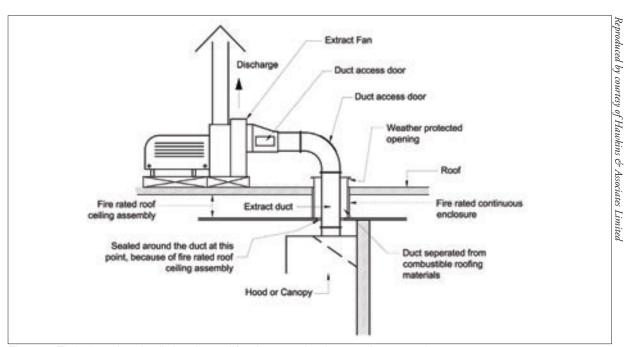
Typical section detail showing wall/roof penetration for a cooker extraction sytem
